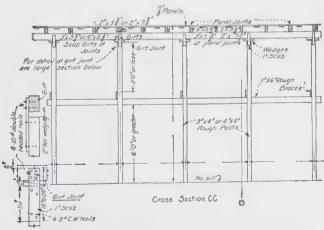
Flat slab floor forms for interior floor bay. Side view.
